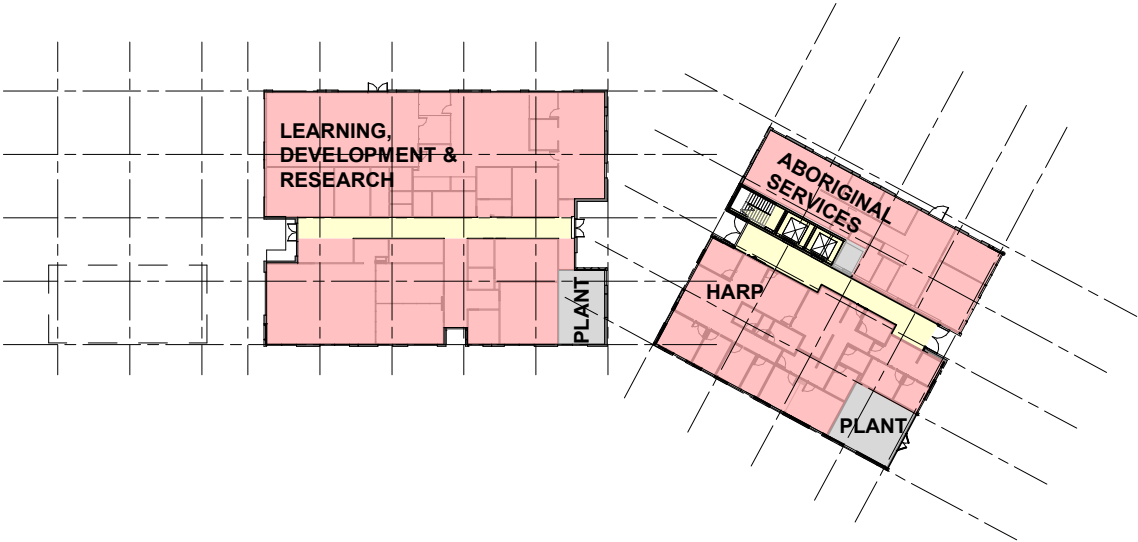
Health Hub, Floor Plan - Ground Level, Block & Stack
